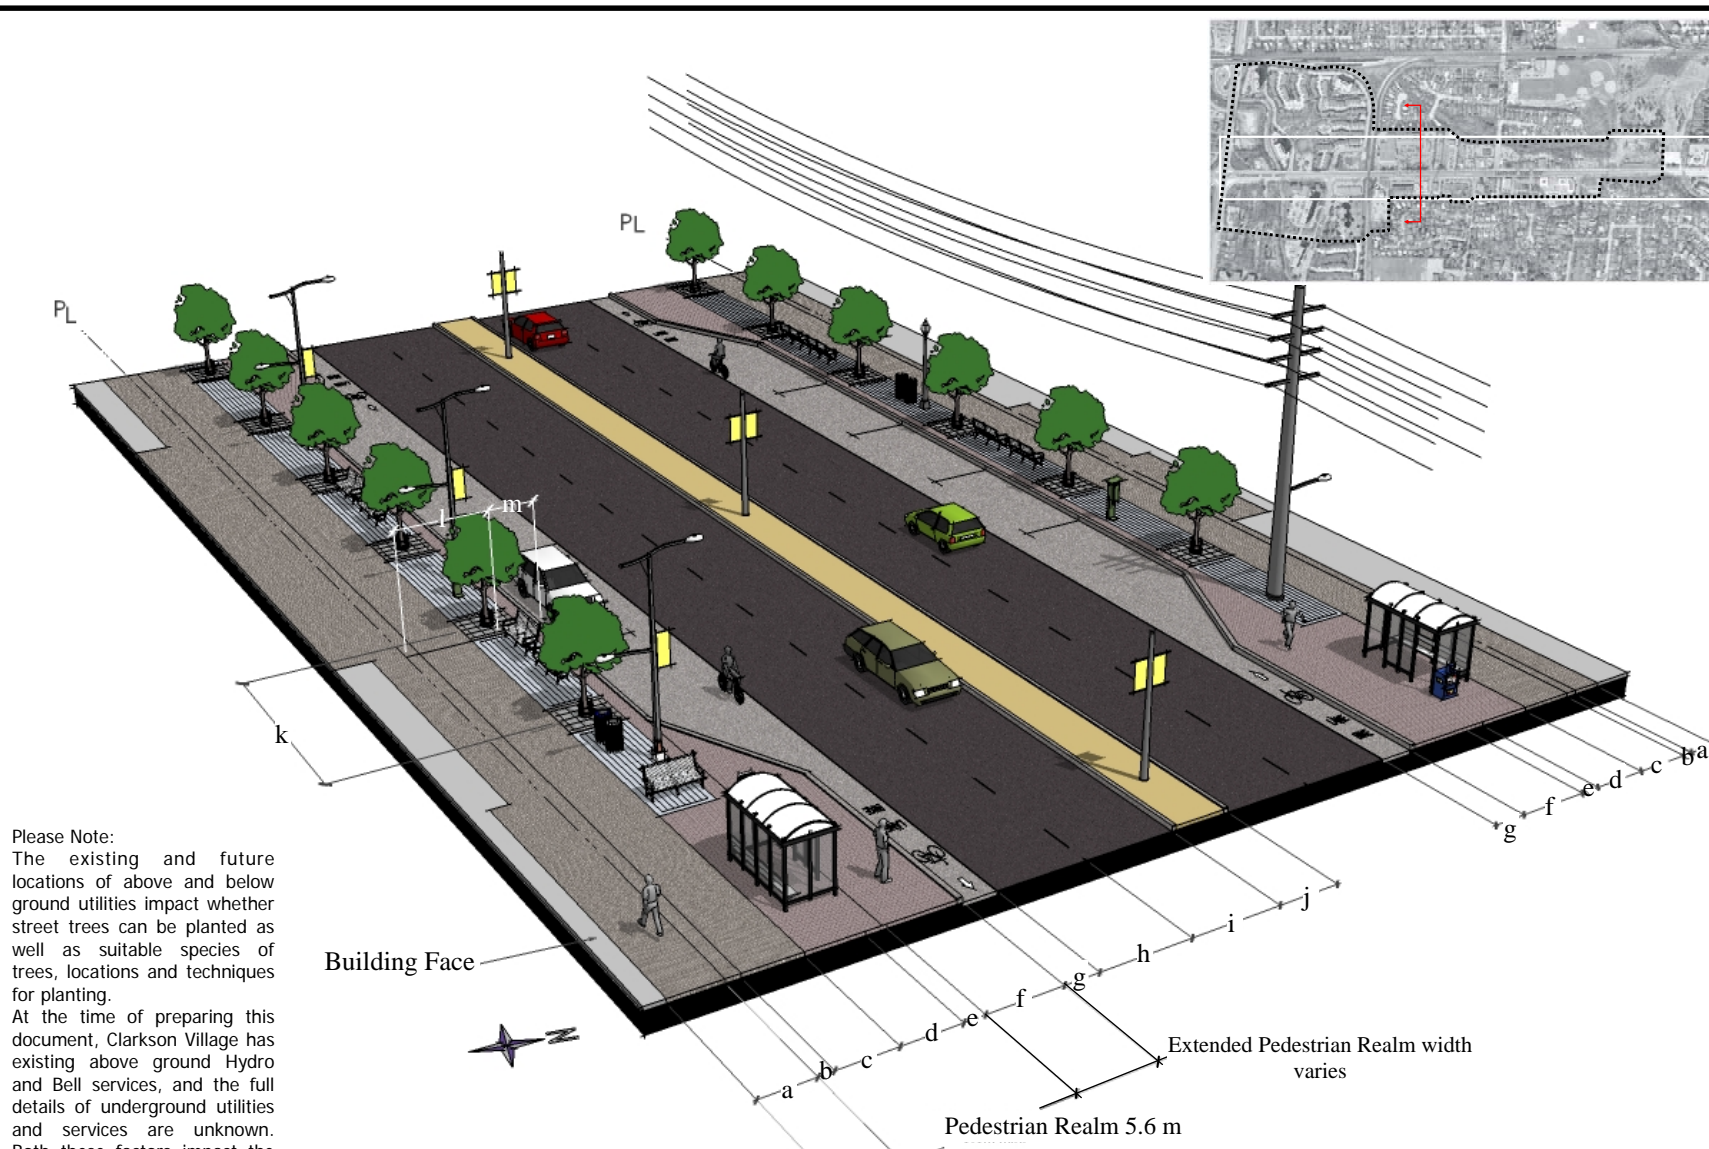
Outer Village Core Area, Mid Block Cross Section, Proposed Streetscape
